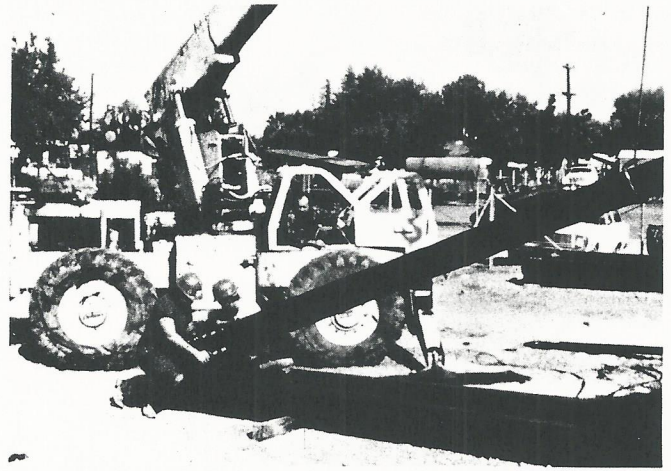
Attaching rear leg of samson post to front leg assembly.
